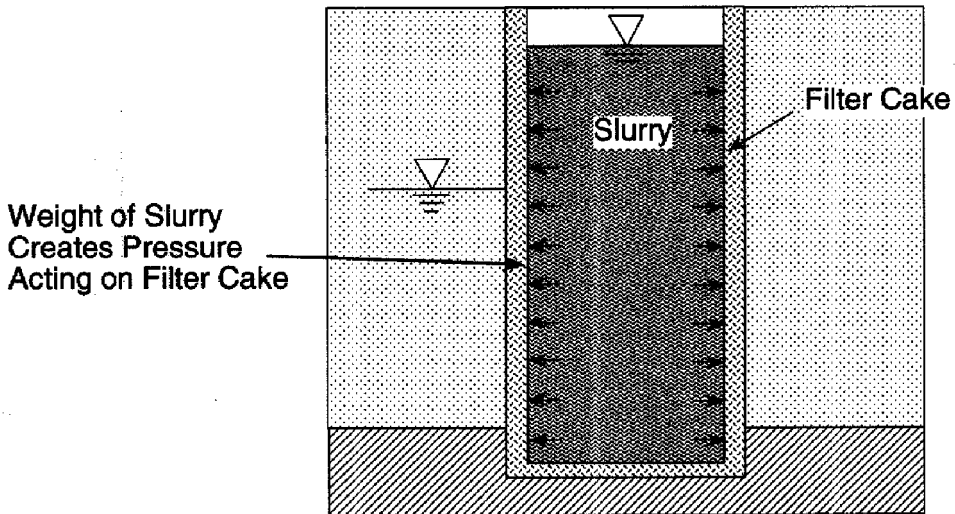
Hydrostatic Pressure from the Slurry Maintains the Stable Walls of the Trench.
